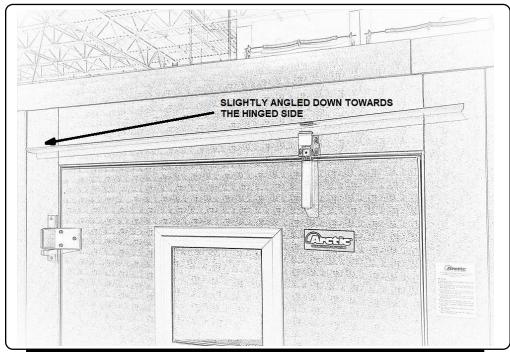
A. DOOR CAP INSTALLATION FRONT VIEW
